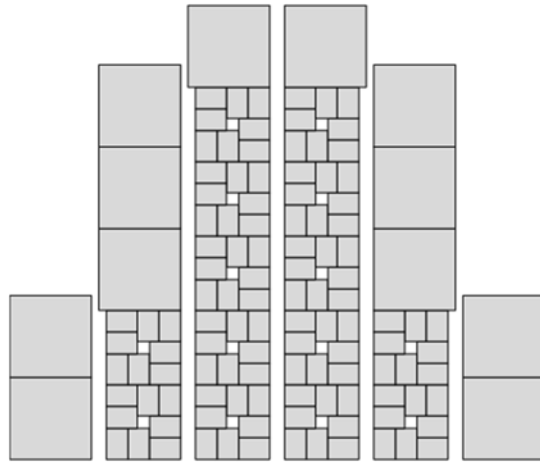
Schematic Plan View of Test Array (Tests 1-3)
